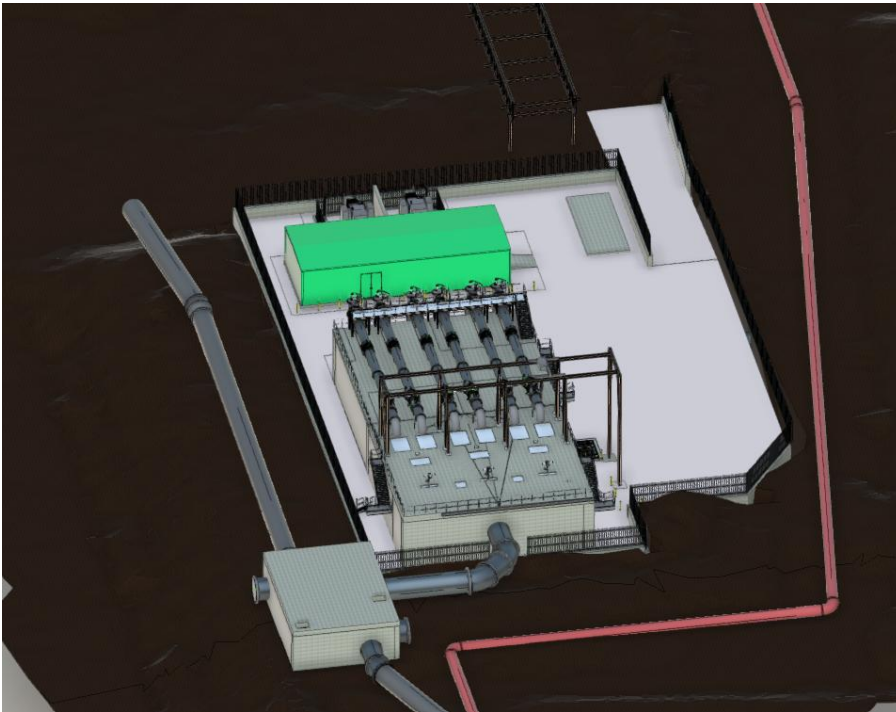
PUMPING STATION PROPOSED LAYOUT
